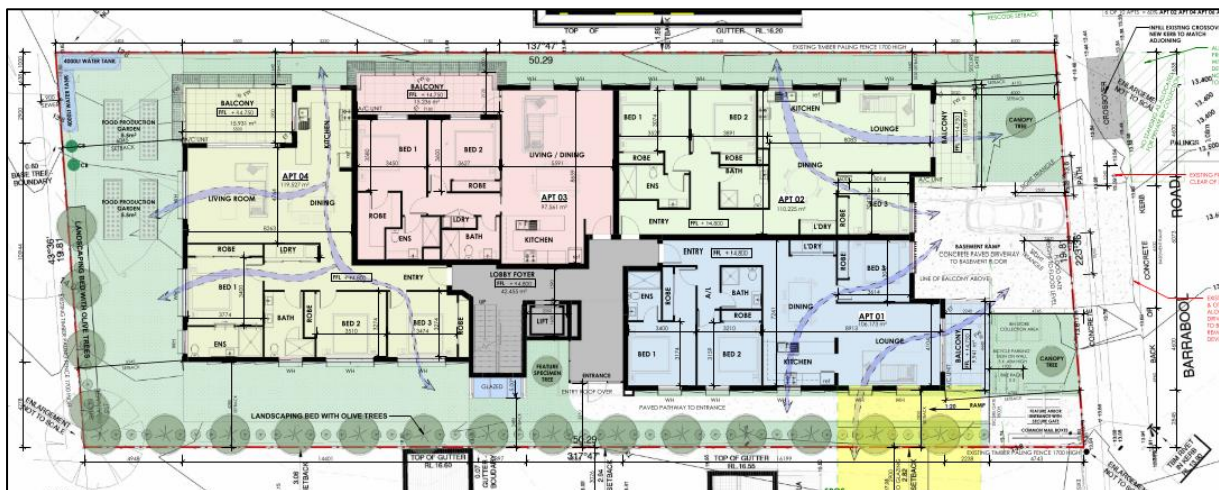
Ground floor plan showing common entry, apartment and private open space (balcony) layouts. Source: Application documents.
